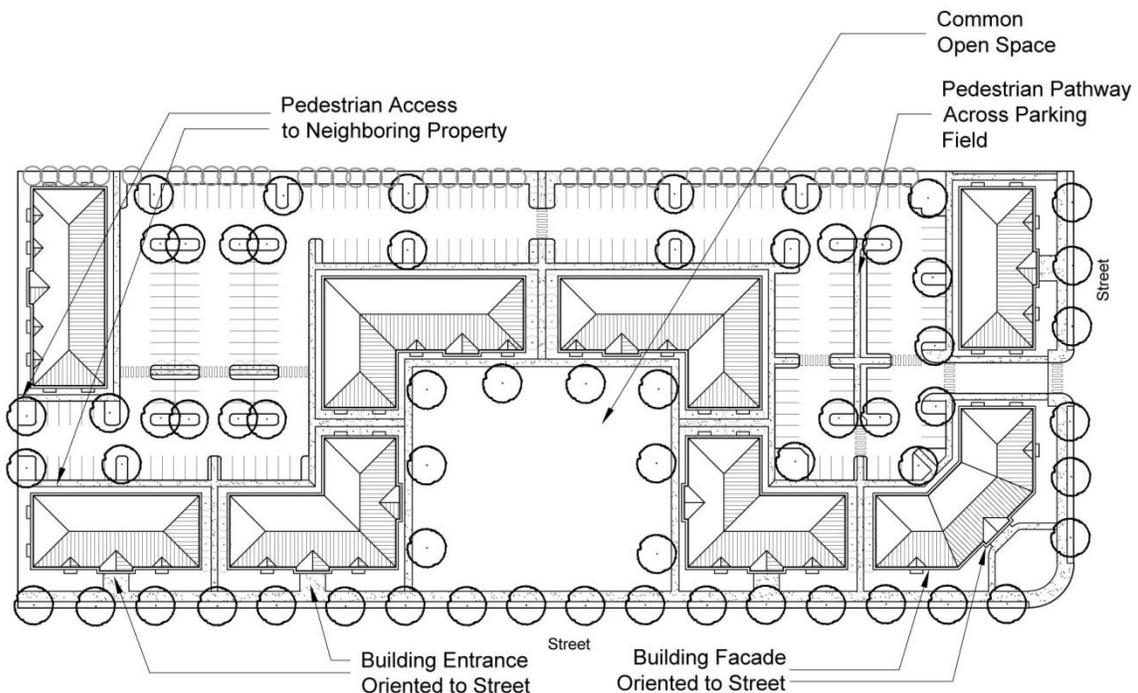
(e).4 – Site Layout – Pedestrian Standards
